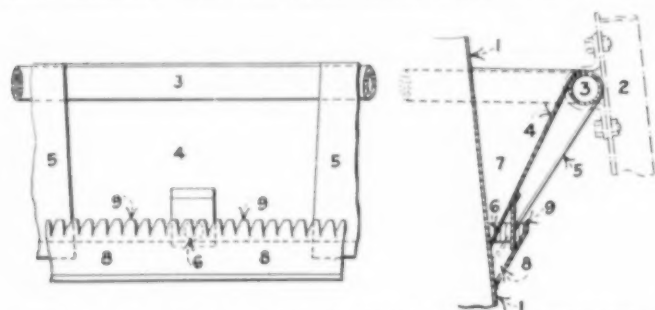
ELEVATION AND SECTION OF LEAD TROUGH
